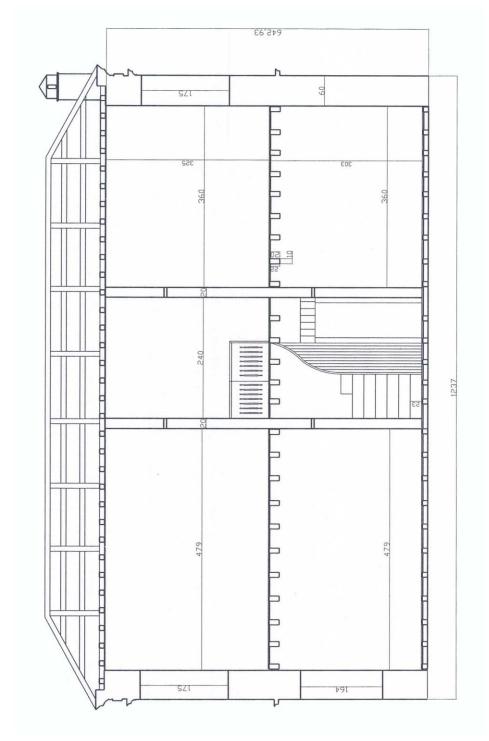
Section A-A view of 19-Hamam Street Scale: 1/75
